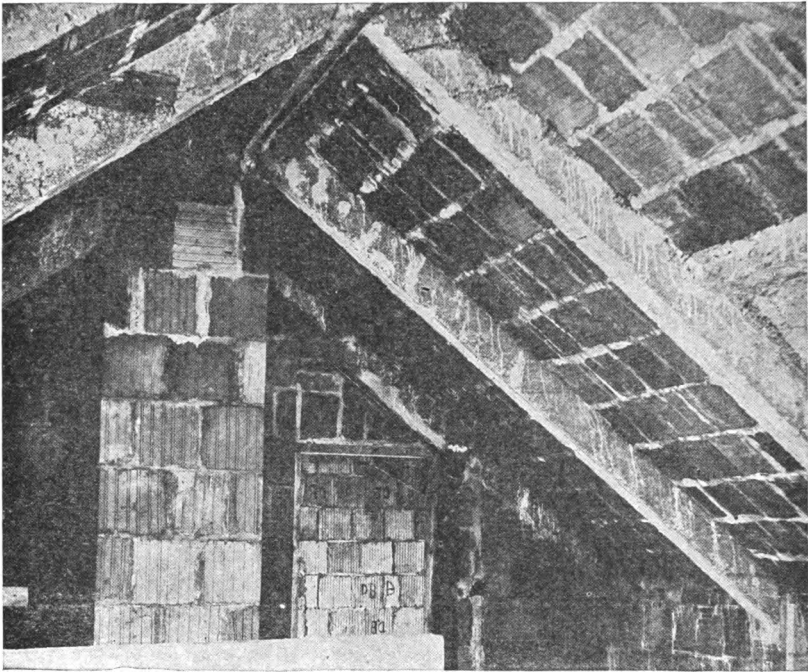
Showing Concrete Beams and Tile Slabs of Fireproof Roof
